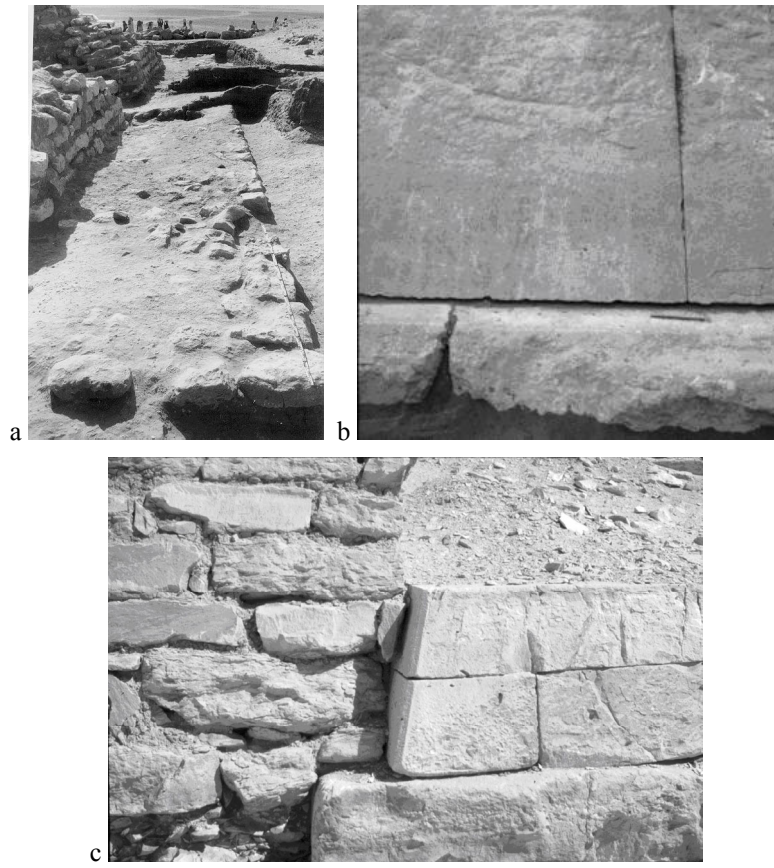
Sinki north corner foundation for facing (a); Red Pyramid east side foundation and facing (b); Netjerykhet initial mastaba NW corner foundation and facing.
